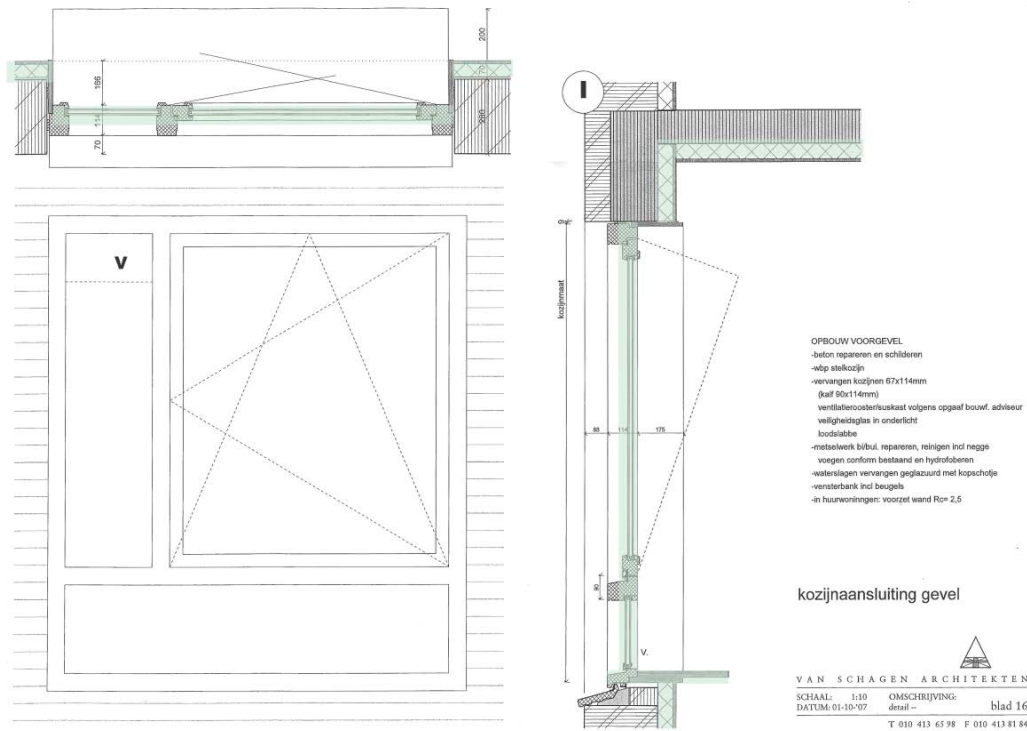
Detail, inside insulation and new window, (Source: Van Schagen Architecten)
